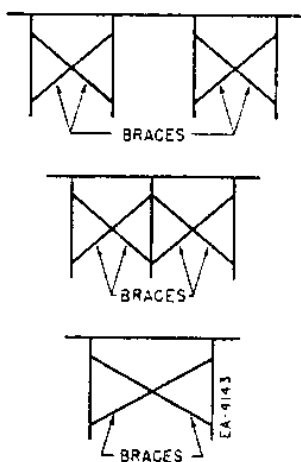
Sketch showing position of braces for 2-tier, also 2- and 3-tier step racks.
